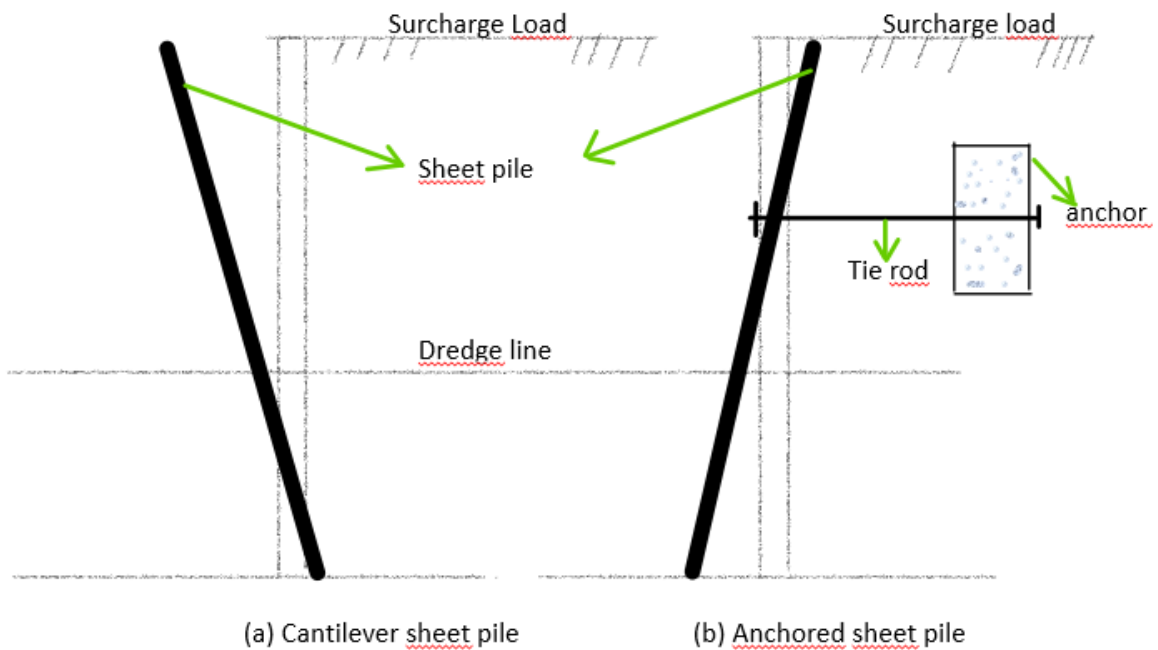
Rotational failure of both the cantilever and anchored sheet piles. Illustrated by Yonas Tsighe
